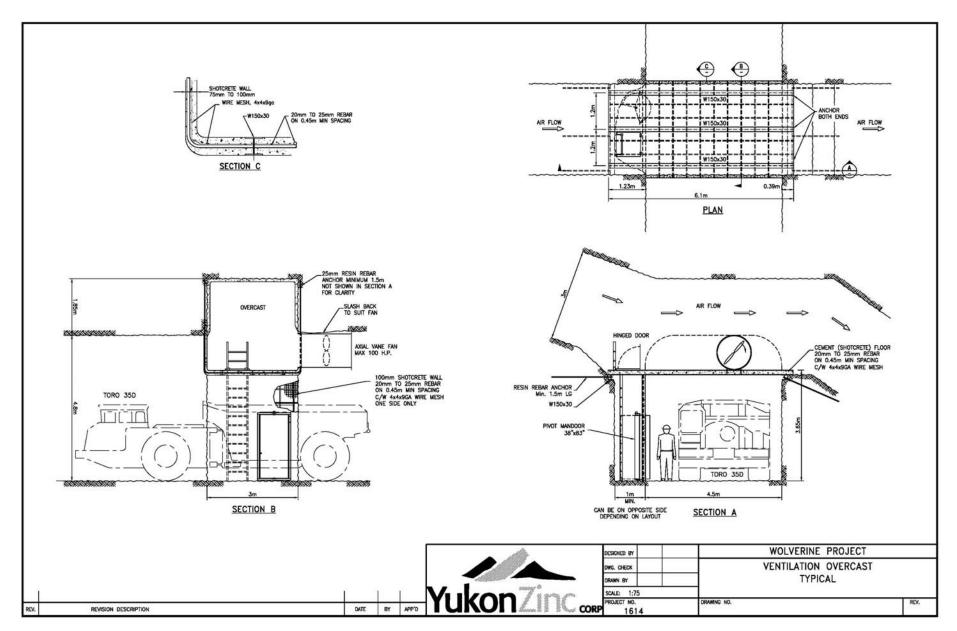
Plan View and Sections Through Typical Ventilation Overcasts
